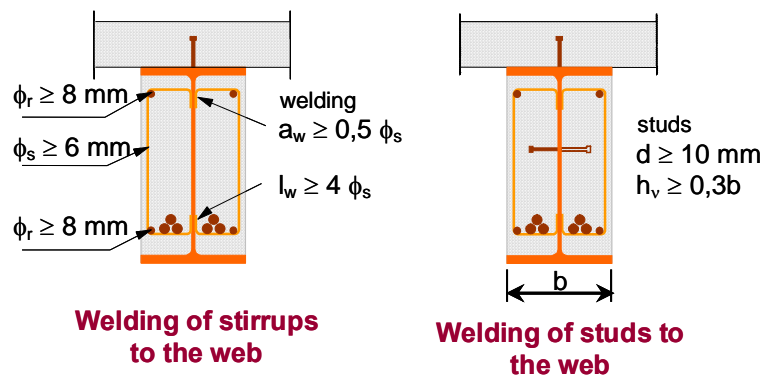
Example of constructional details to have enough connection resistance between steel and concrete in fire situation according to EN1994-1-2
